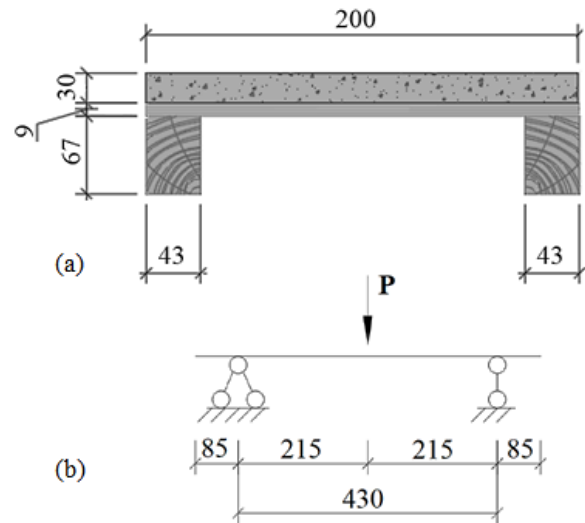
TCC ribbed slab specimen (a) cross-section, (b) design scheme.
